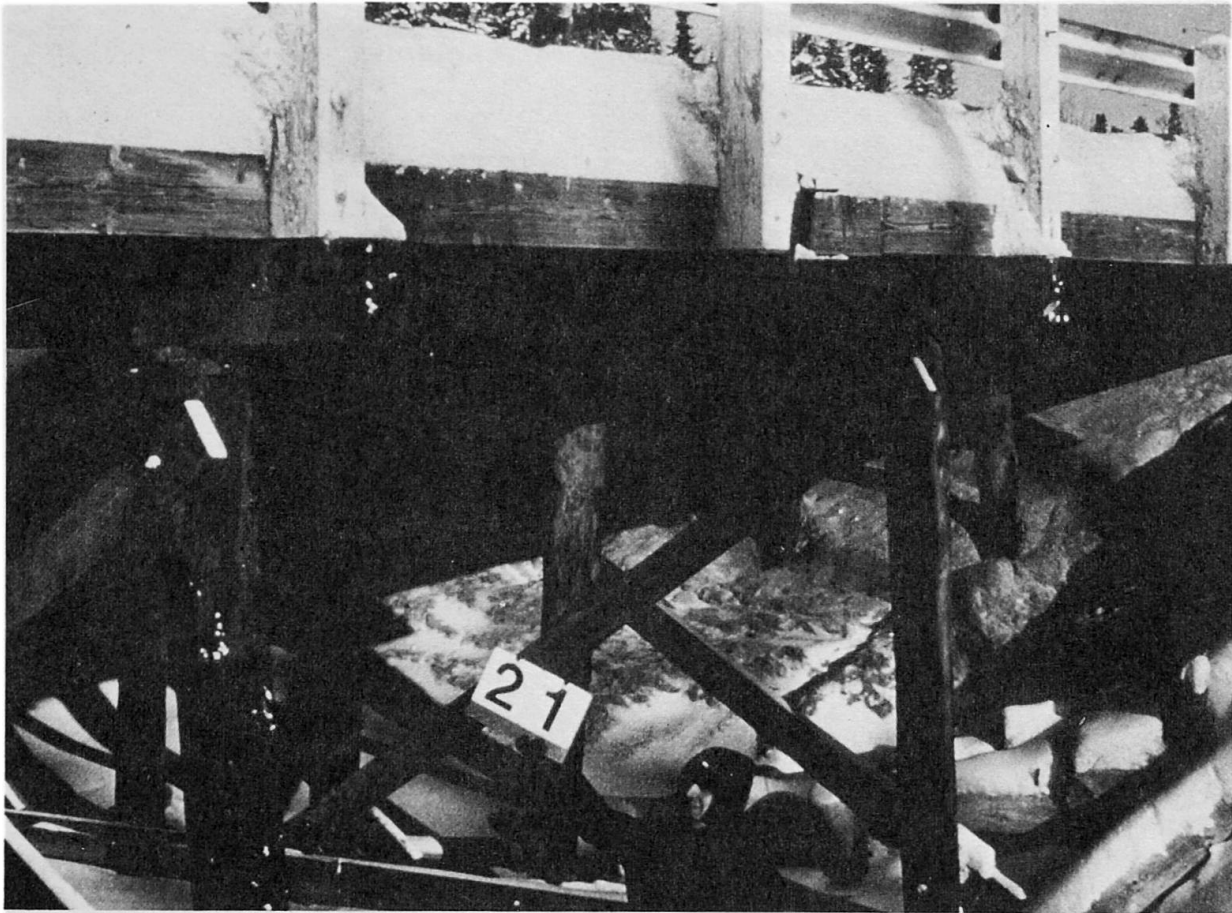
Side View of McCarthy Creek Bridge. A Typical Laminated Deck on Pile Bents
